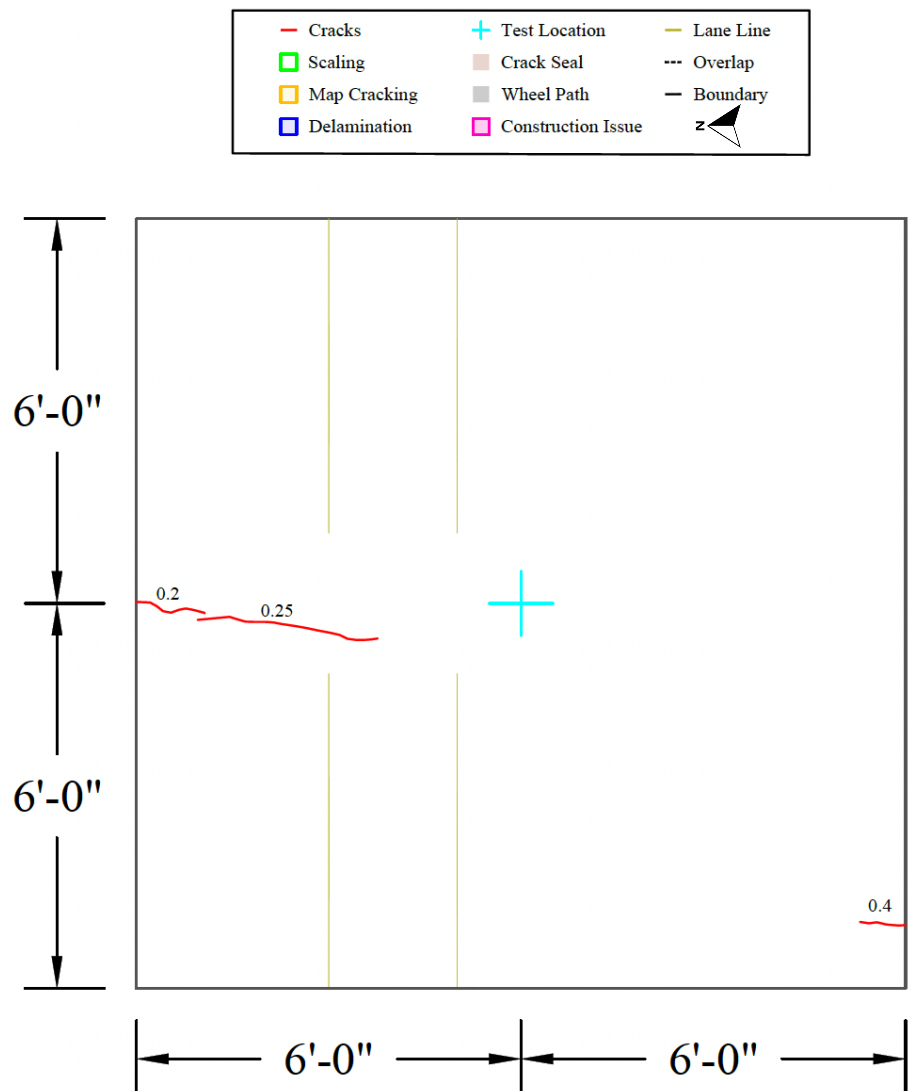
Test location 2 of lightweight concrete deck at bridge C-989.
